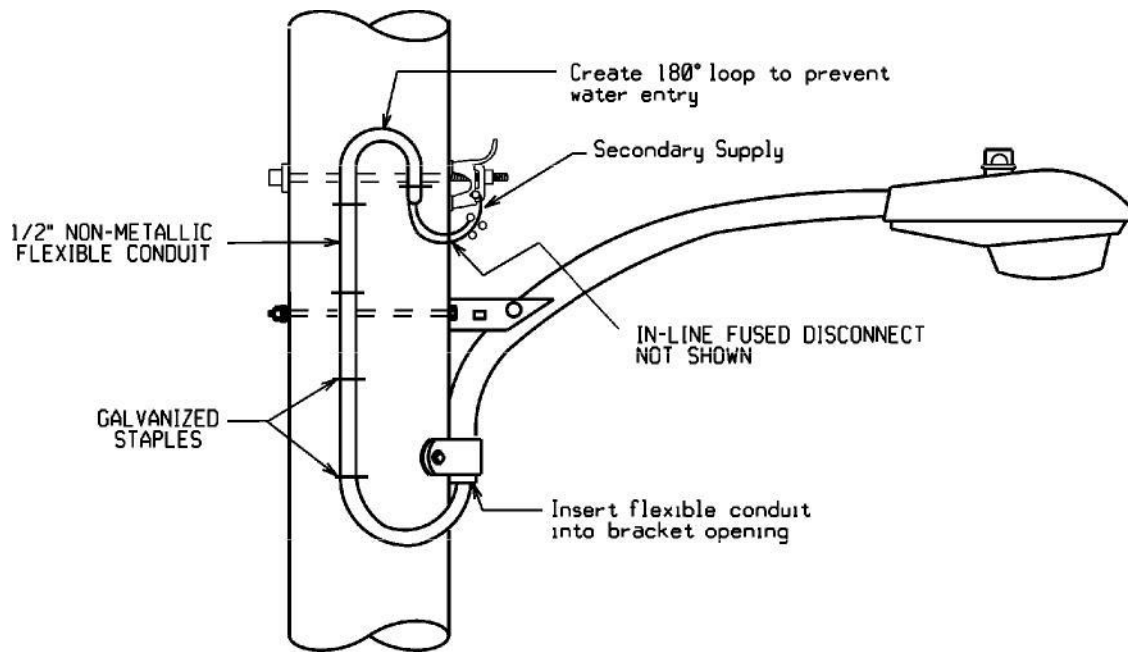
Mechanical Protection for Overhead Supplied Outdoor Light Fixture Conductors
